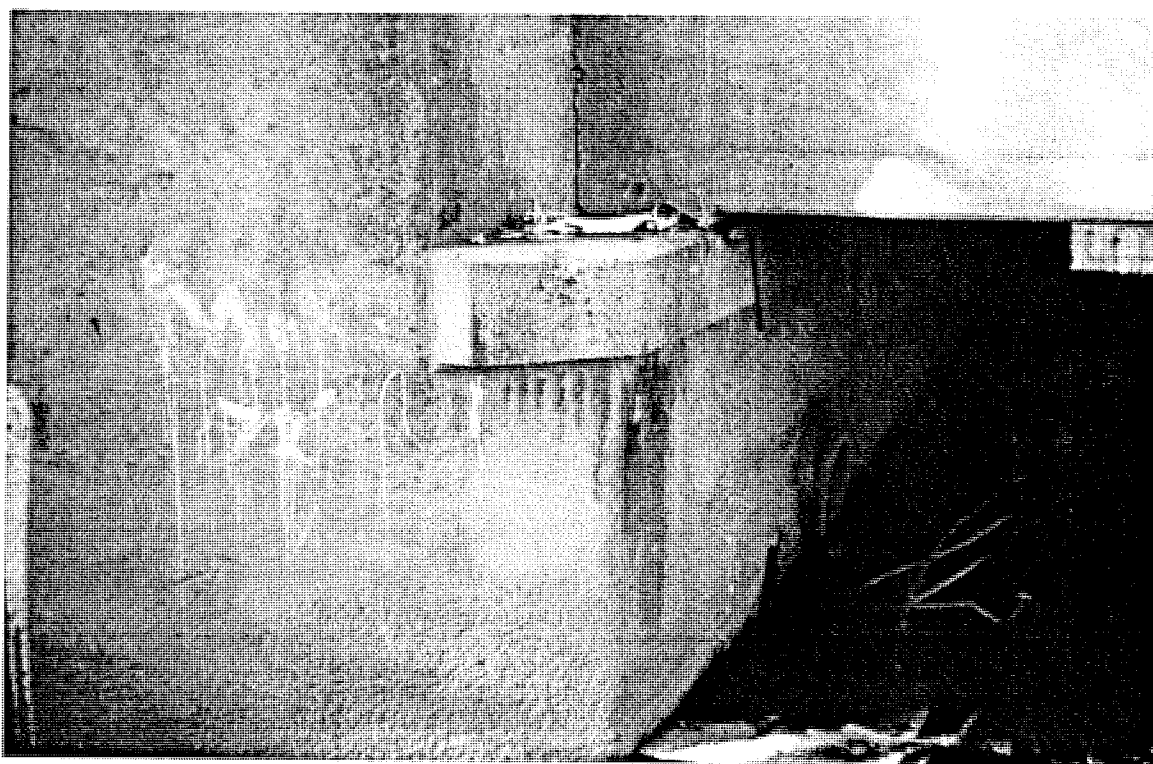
Photograph of Bridge No. 1103-151, Route 1 over Shipetaukin Creek, Lawrence Twp., Mercer County, New Jersey.
